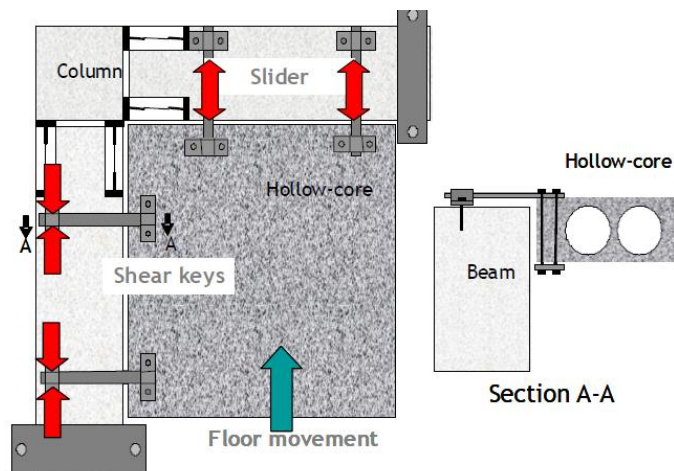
Articulated floor connection (Amaris et al. 2008)
